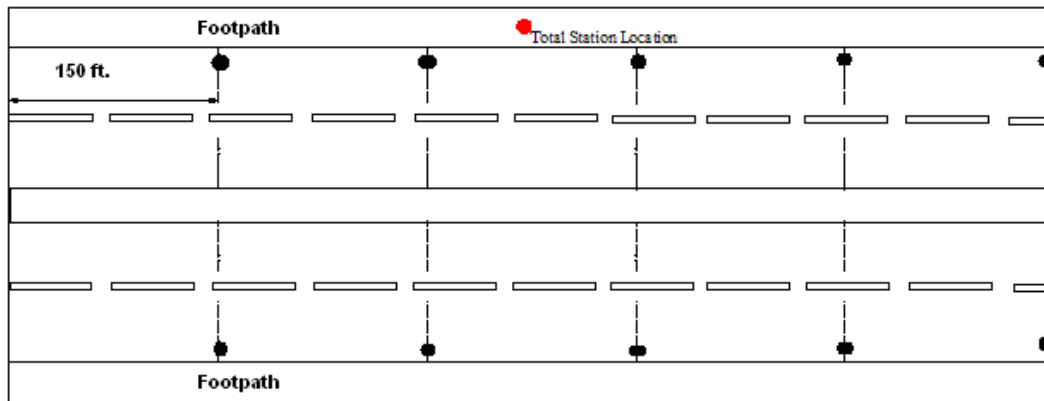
Plan Views of Elevation Survey Points at International Parkway
